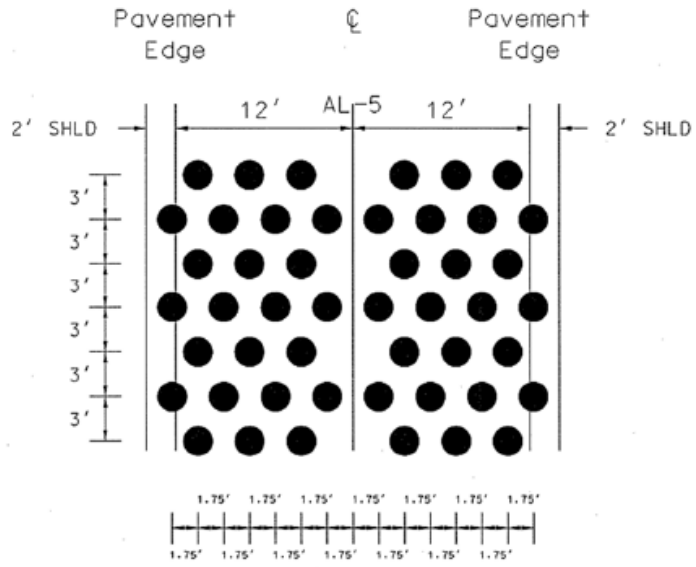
Deep Mixed Columns Layout (ALDOT 2015)
